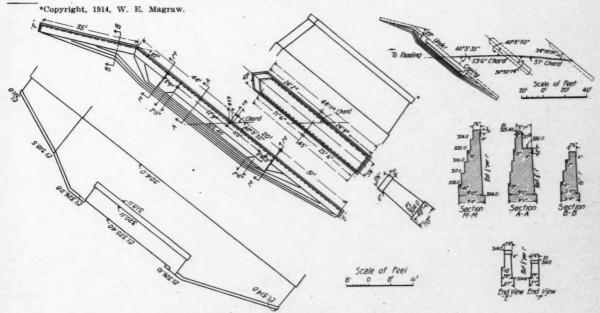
Plain Concrete Pier and Abutment, P. & R. Ry.
